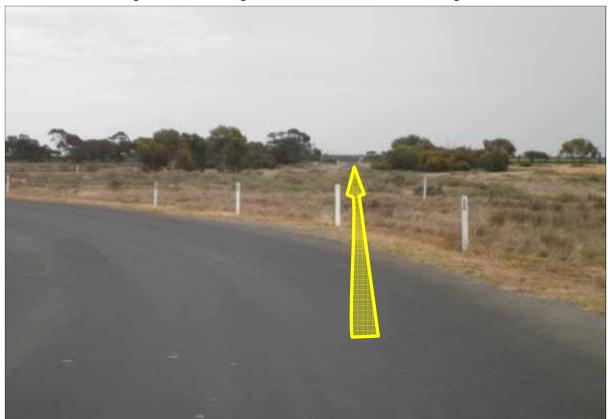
Looking southwest along McCabe Street towards the McCabe Street / Sturt Highway intersection. Shows the wide pavement which exists outside K & SL Nelson Nominees Pty Ltd grain store operations, approximately 150m northeast of the Sturt Highway intersection. The traffic paths along McCabe Street have a lateral shift through this section of McCabe Street. At night the lateral shift is not clear and the correct through path not apparent for drivers.
